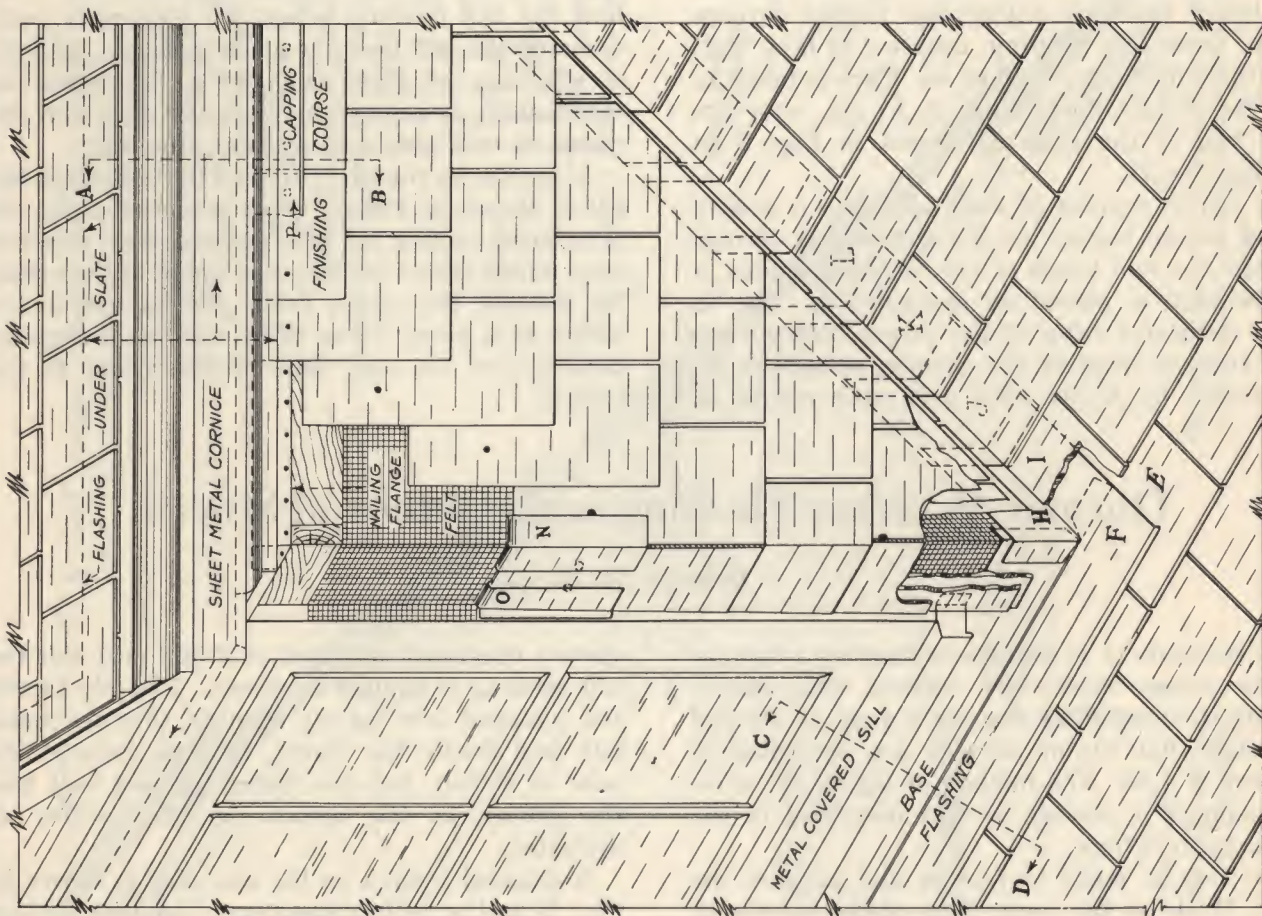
FLASHING DORMER WINDOW WHEN CHEEKS, FRONT AND ROOFS ARE COVERED WITH EITHER SLATE FLAT TILE OR SHINGLE
